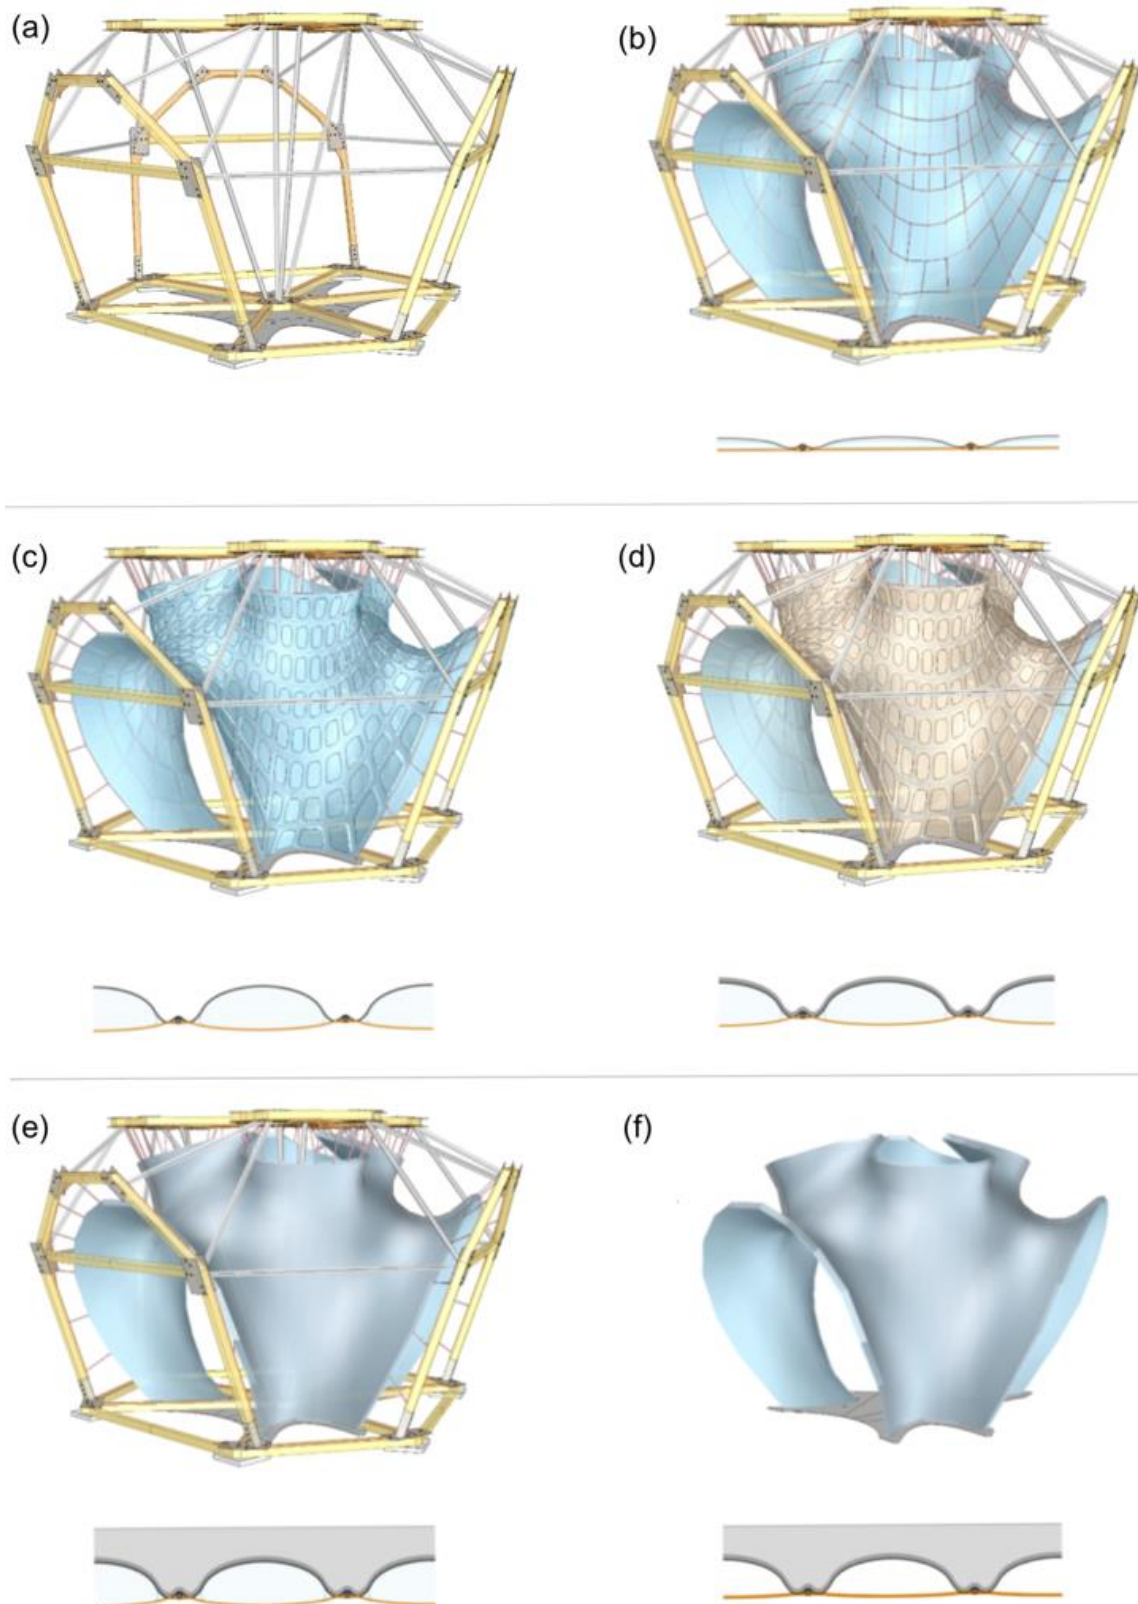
Construction process of the KnitCandela: (a) external frame; (b) tensioned knit; (c) inflated pockets; (d) initial cement-paste layer; (e) structural concrete; (f) final structure (Popescu, 2019)
